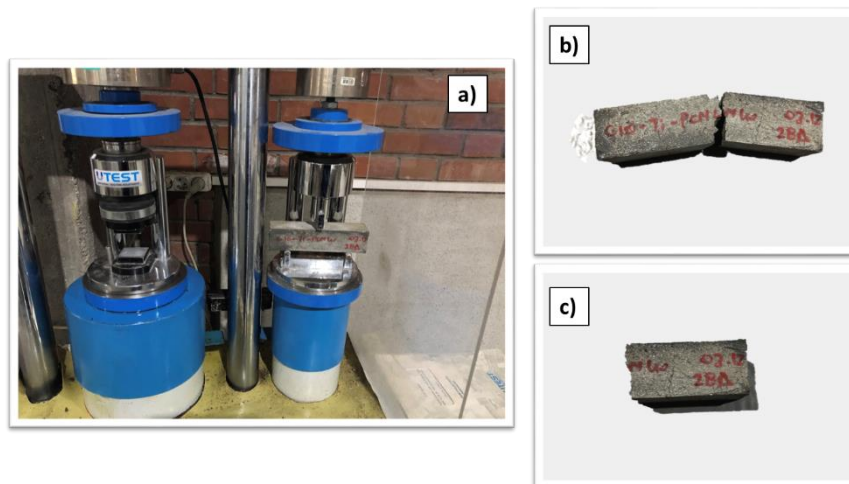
a) Universal test machine used for measuring flexural and compressive strength
